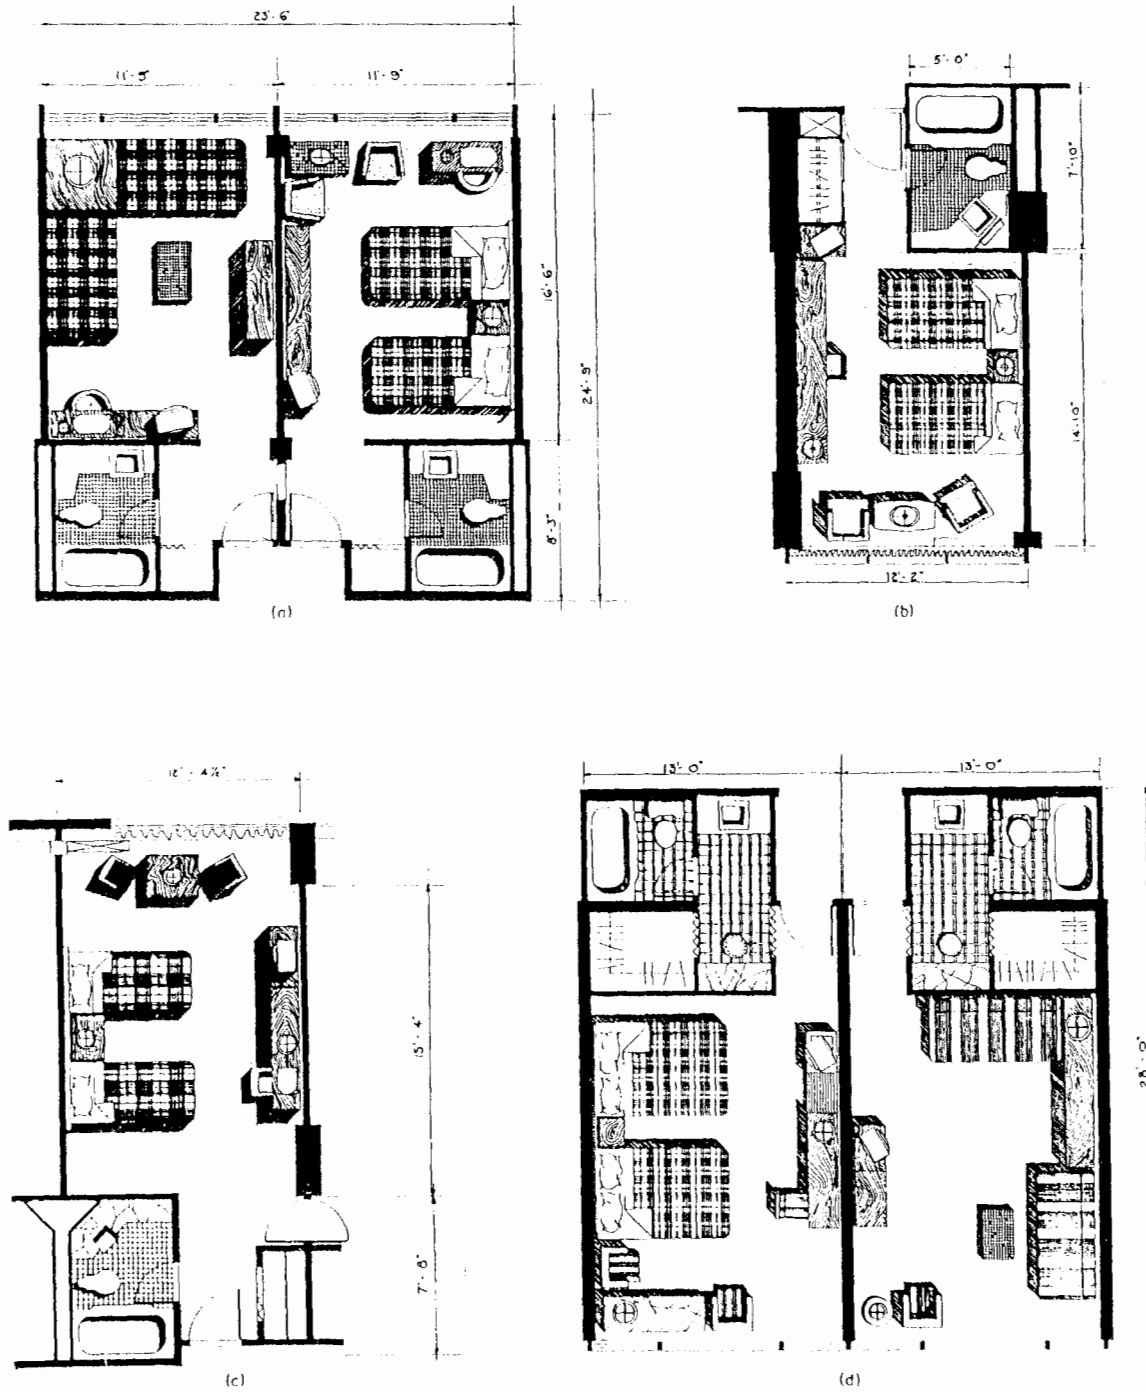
(a) Uris Brothers Hotel, New York. (b) Americana Hotel, New York, typical tower room. (c) Loews N.Y. Motel, typical room. (d) Causeway Inn, Tampa, Florida.
